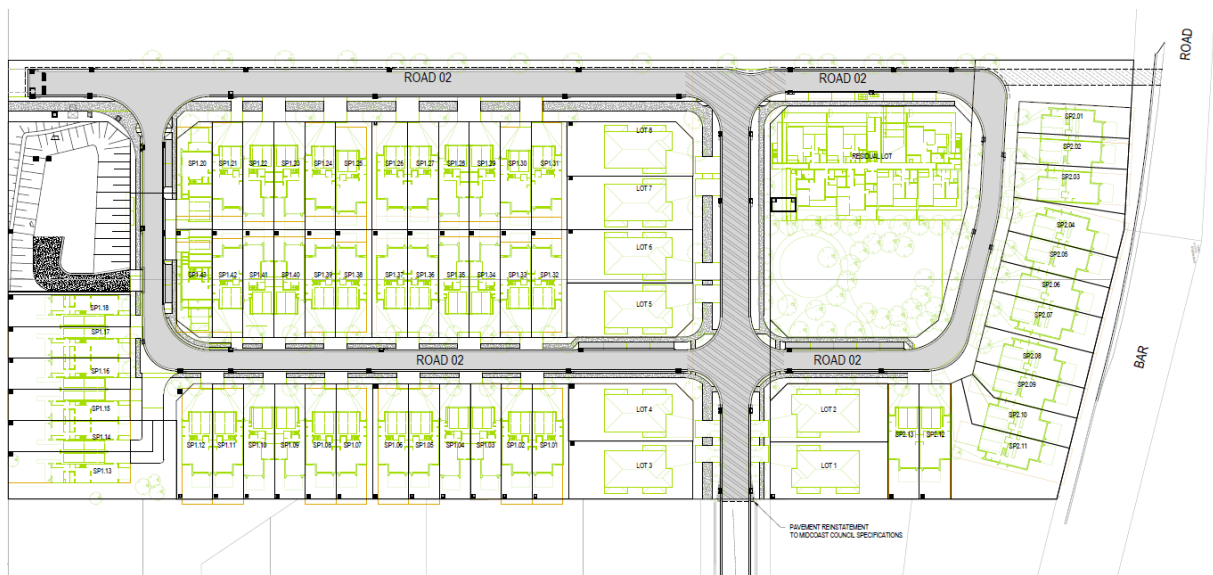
Road and Footpath layout. Source: Enspire Civil Engineering Works Plans Drawing no. 210036-DA-C11.01
